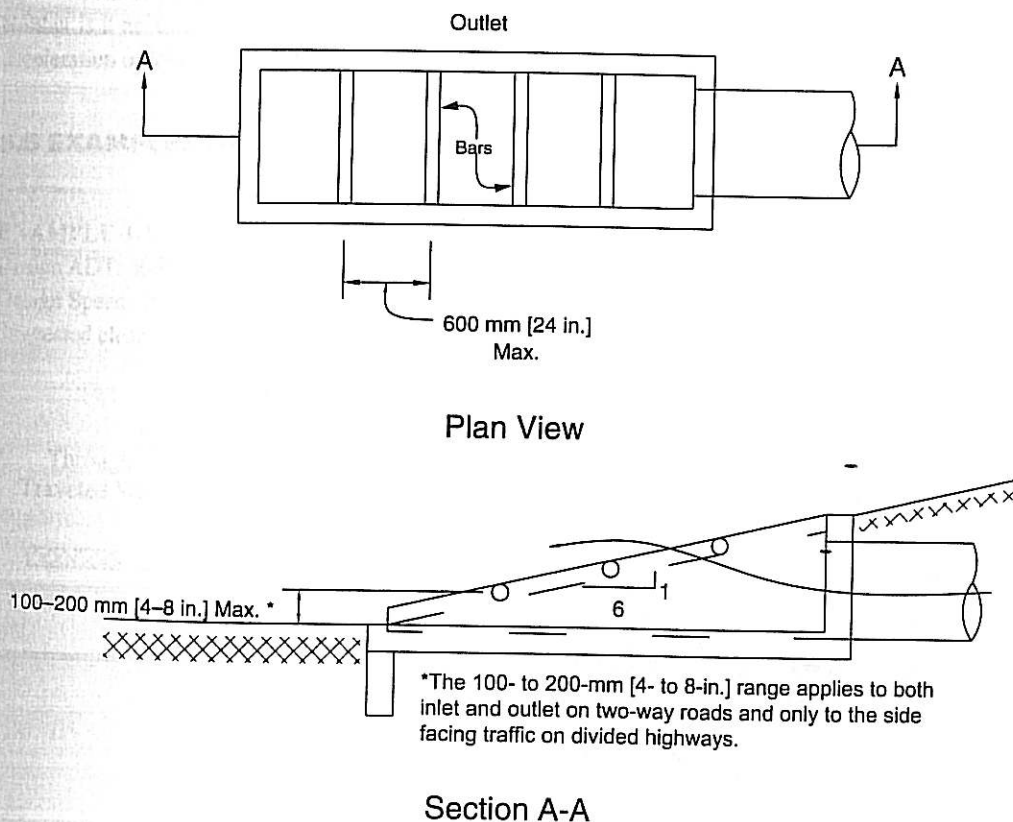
Inlet and Outlet Design Example for Parallel Drainage
